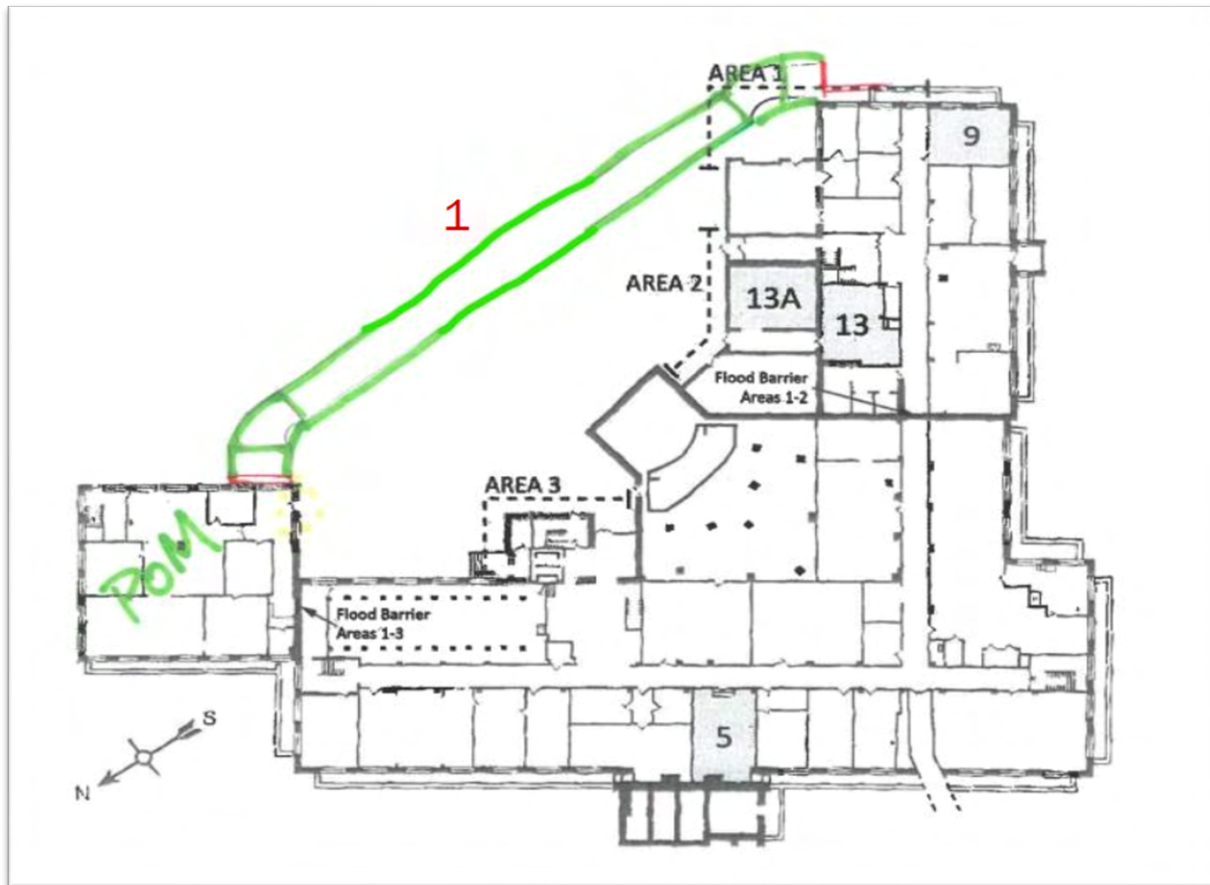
Alternative flood proofing solution using the GeoDesign barriers.
